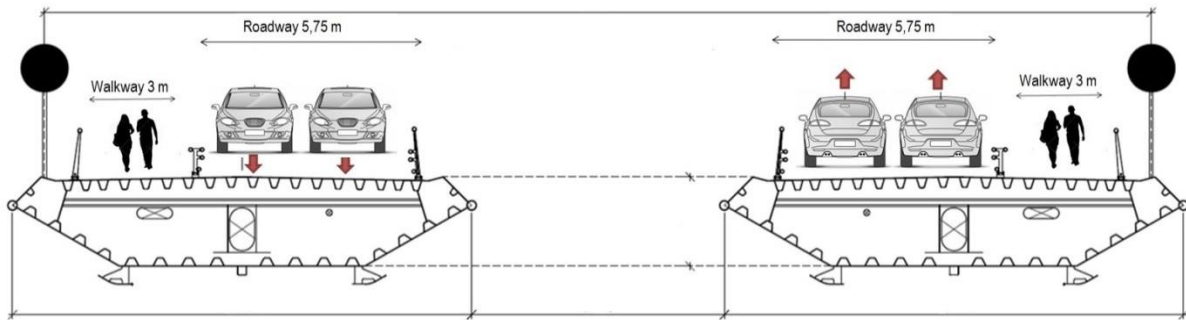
Cross section of the two load-bearings unit with roadway and walkway widths.
